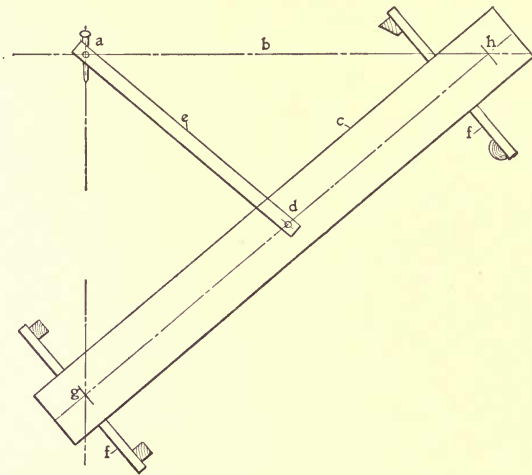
“SQUARING A LINE” WITH THE RADIUS BOARD.
